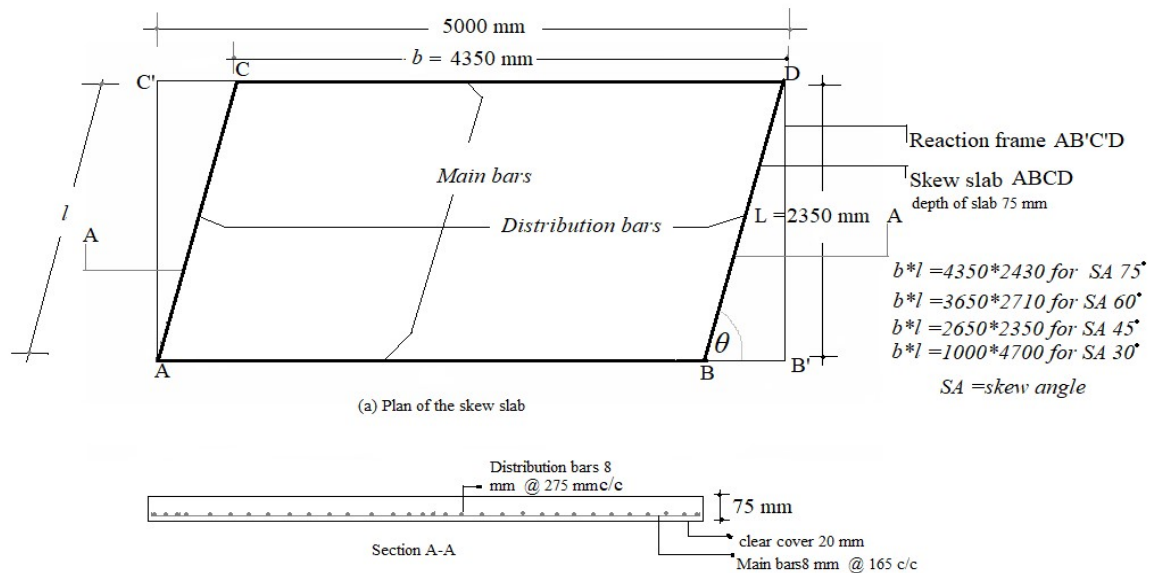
Dimensions and the reinforcement details of skew slab specimens
